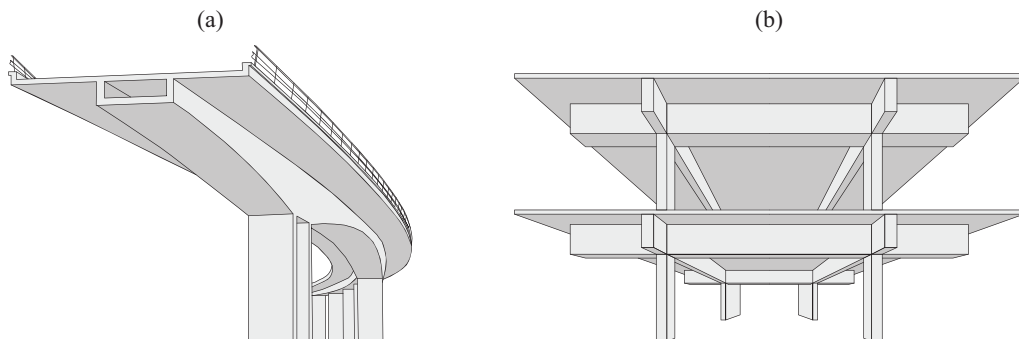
Structural members requiring the application of detailing rules in the case of: (a) bridges; and (b) buildings
